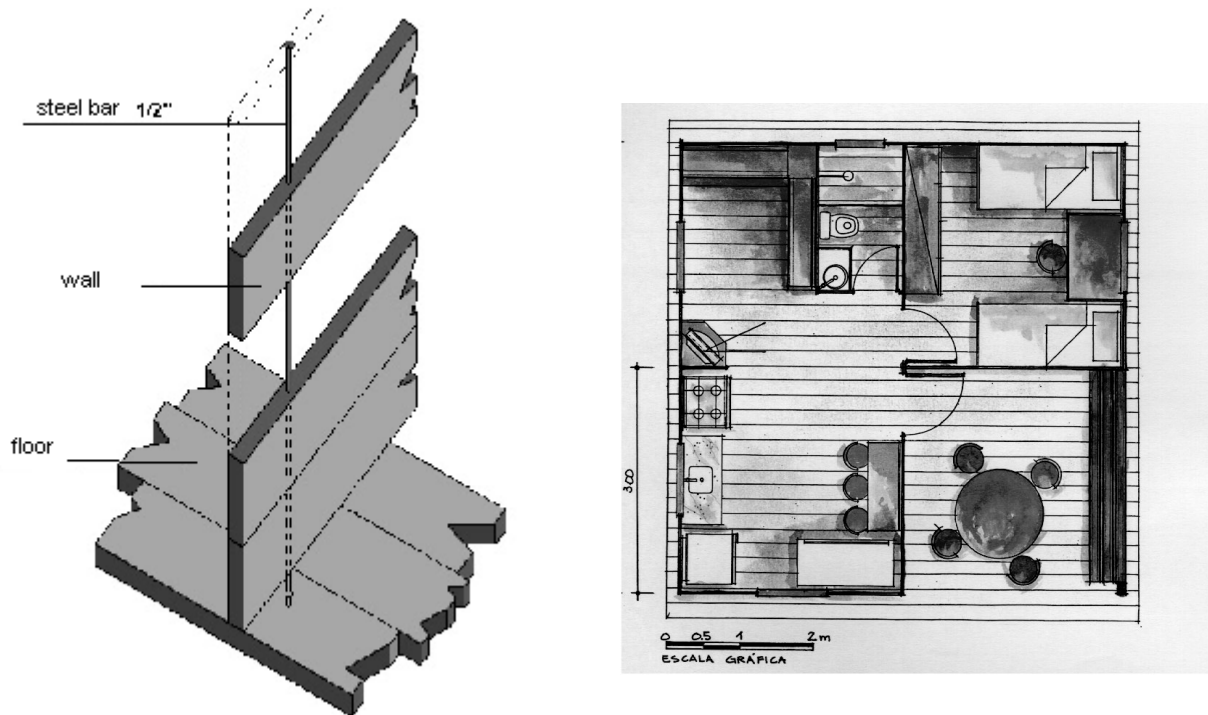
Schematic draw of the beam-slab system and the main building blueprint.
